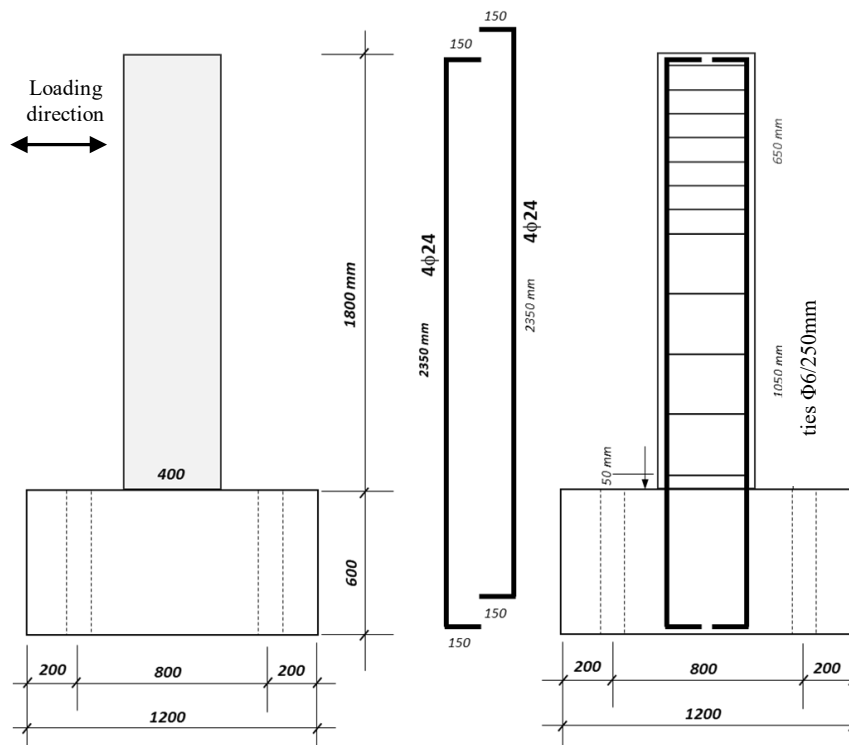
Geometric (dimensions in mm) and reinforcement details of column specimens.
